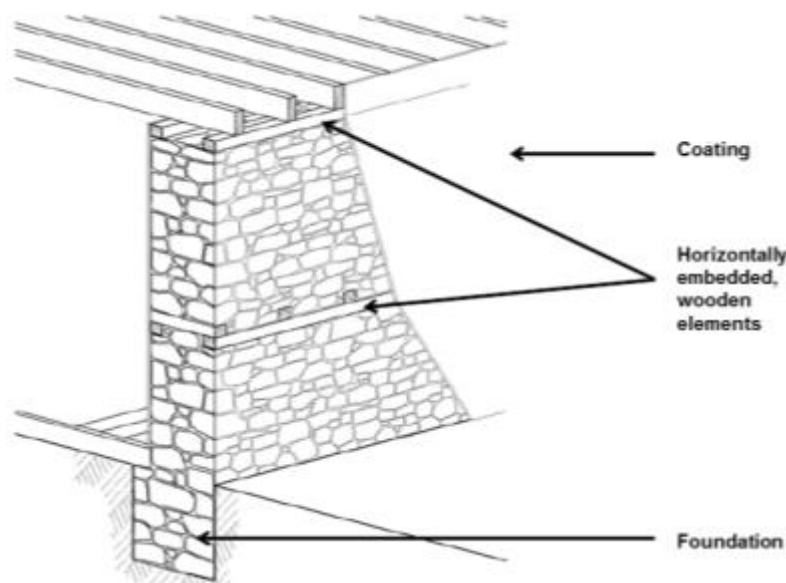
Structural detail of the stone masonry wall and the foundation [11].
